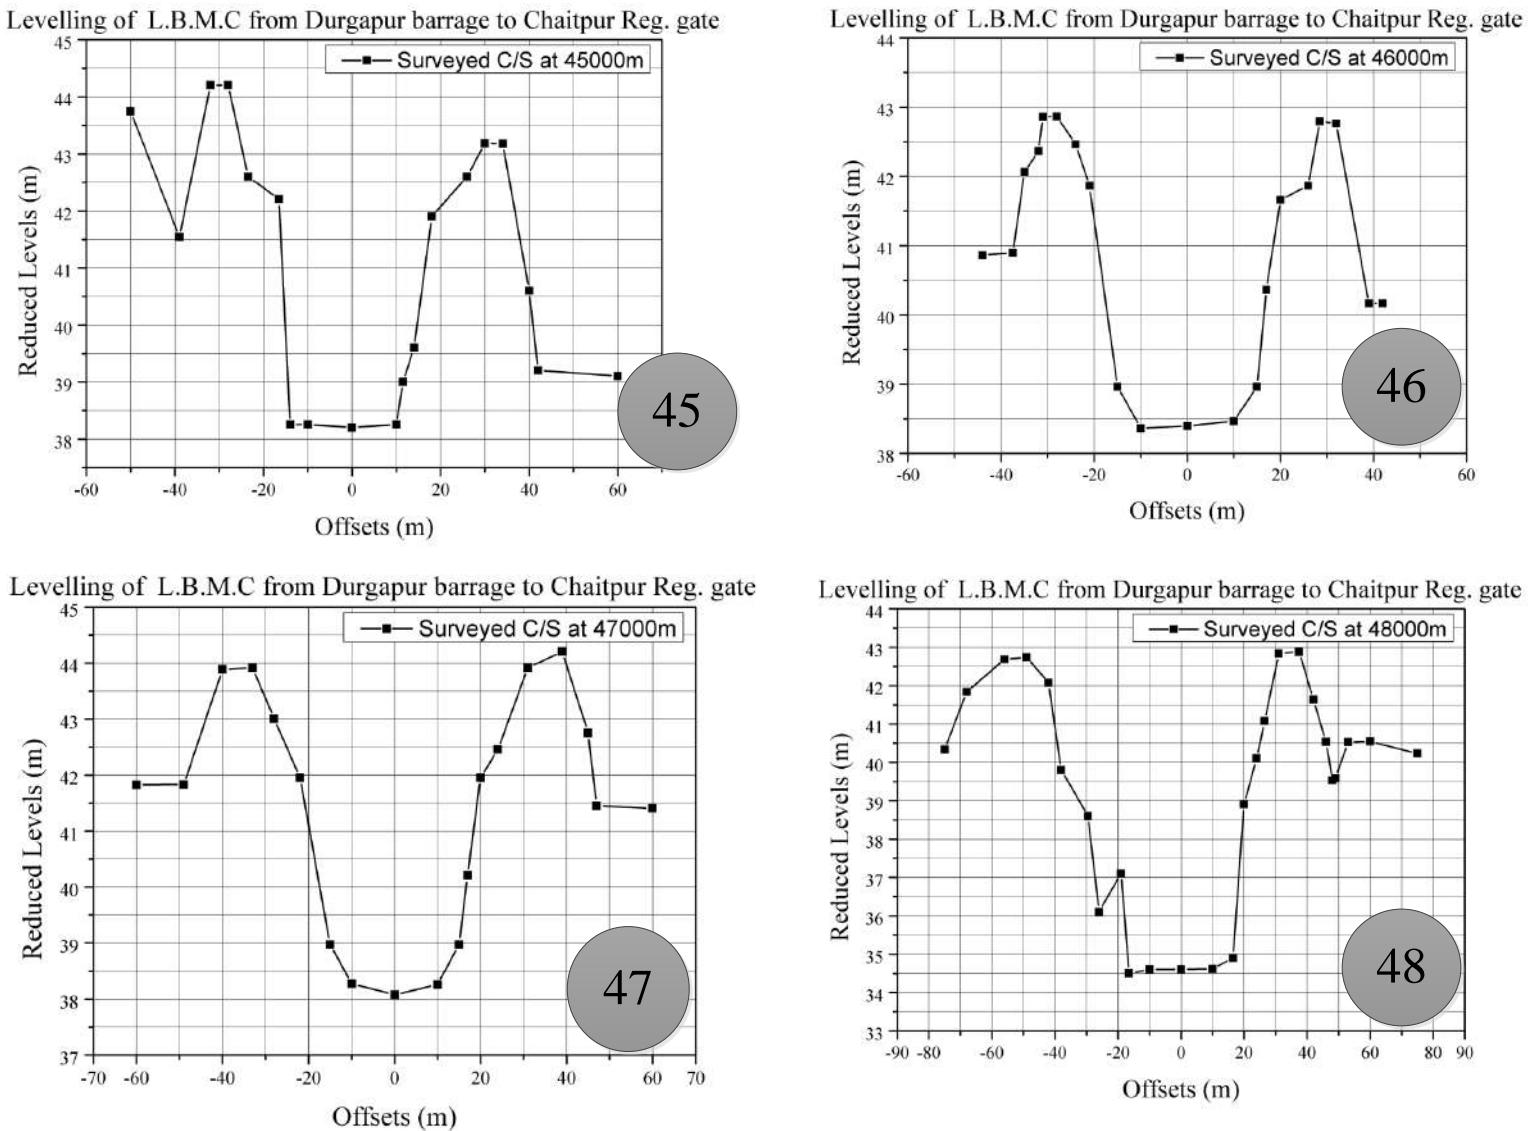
Canal cross section from 45 km to 48 km on Left Bank Main Canal
